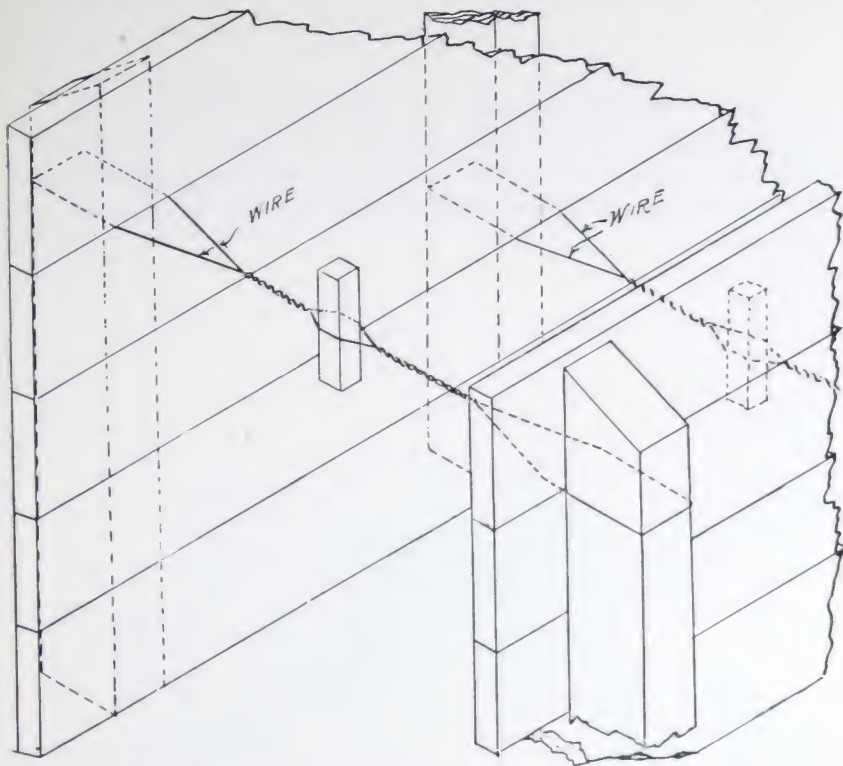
Form for Heavy Wall. (Reproduced by permission from Taylor and Thompson's "Concrete, Plain and Reinforced.")
